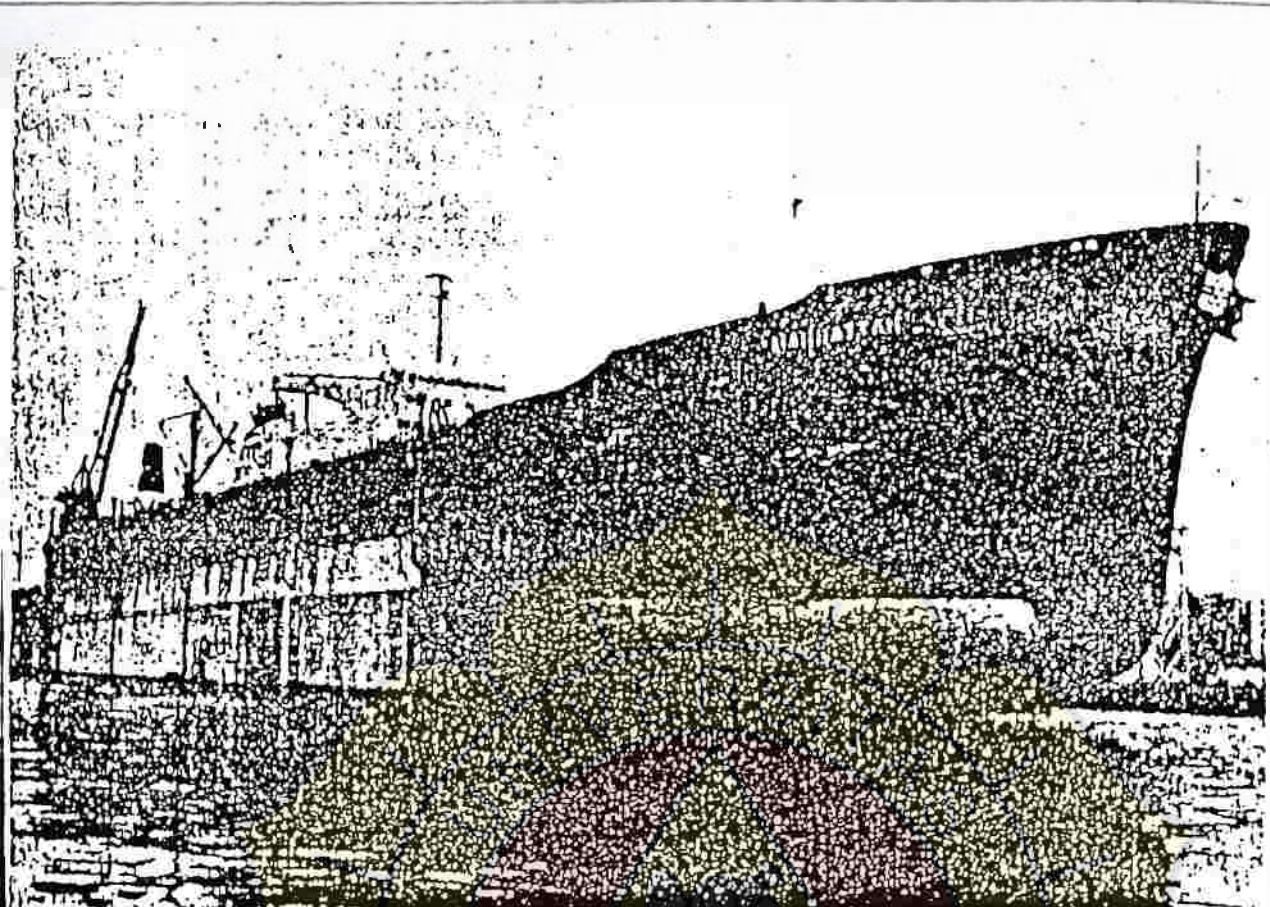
Continuous wingwall drydock with ship much longer than drydock
